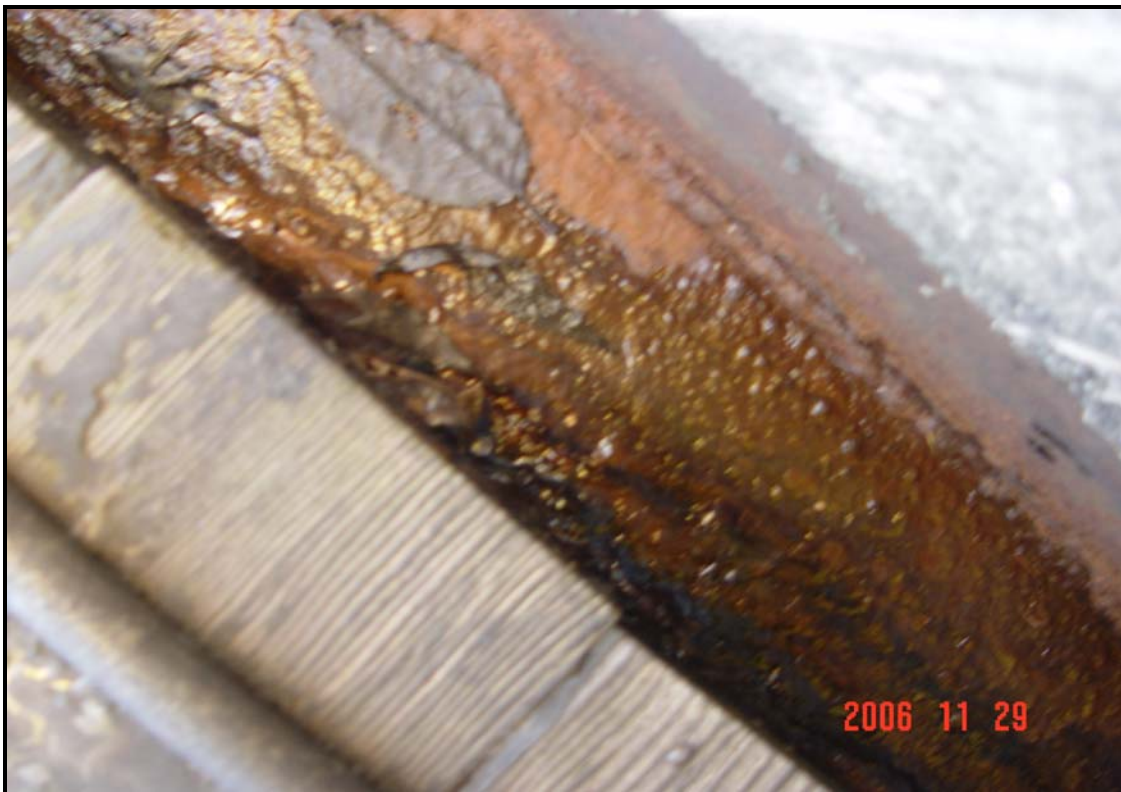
Poor drainage and ventilation near the intake conduit.
